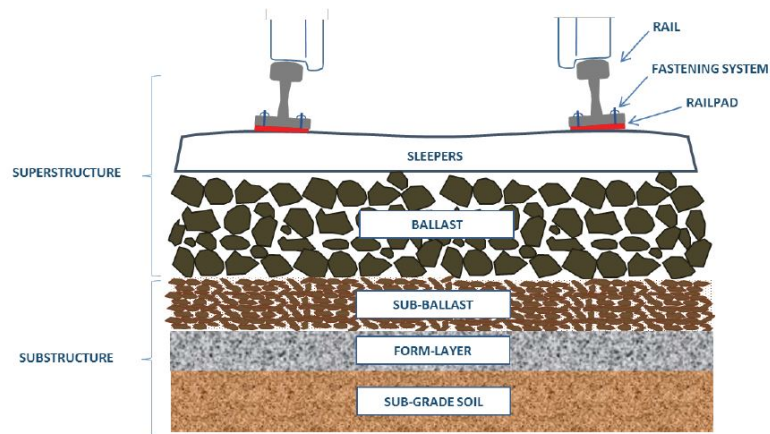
Illustration of a railway track's cross-section and foundation, depicting the ballast and formation layers, adapted from Luca Pirozzolo (2017)
